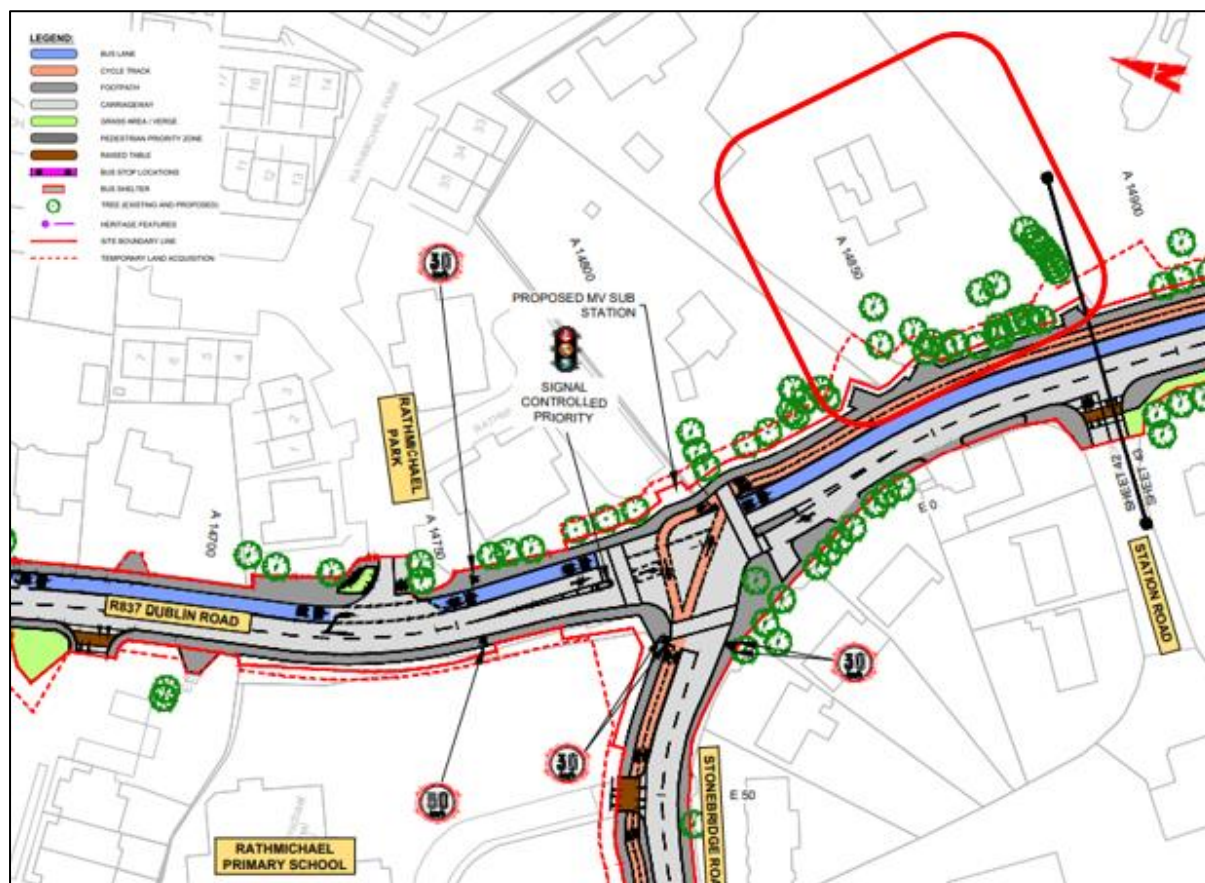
Extract from General Arrangement Drawing on Dublin Road (Sheet 42)
